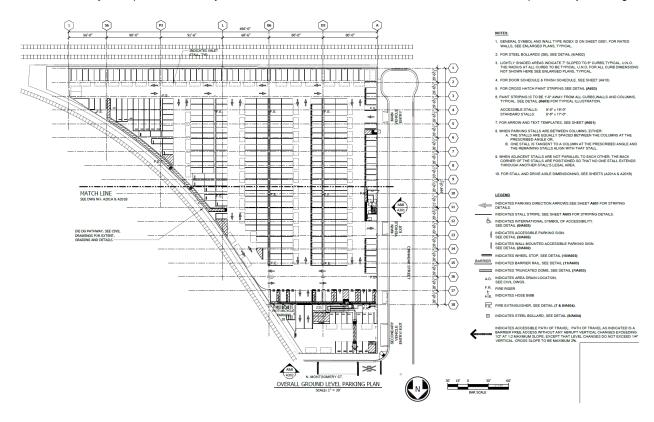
Ground-Level Parking Plan at 501 Cinnabar Street
